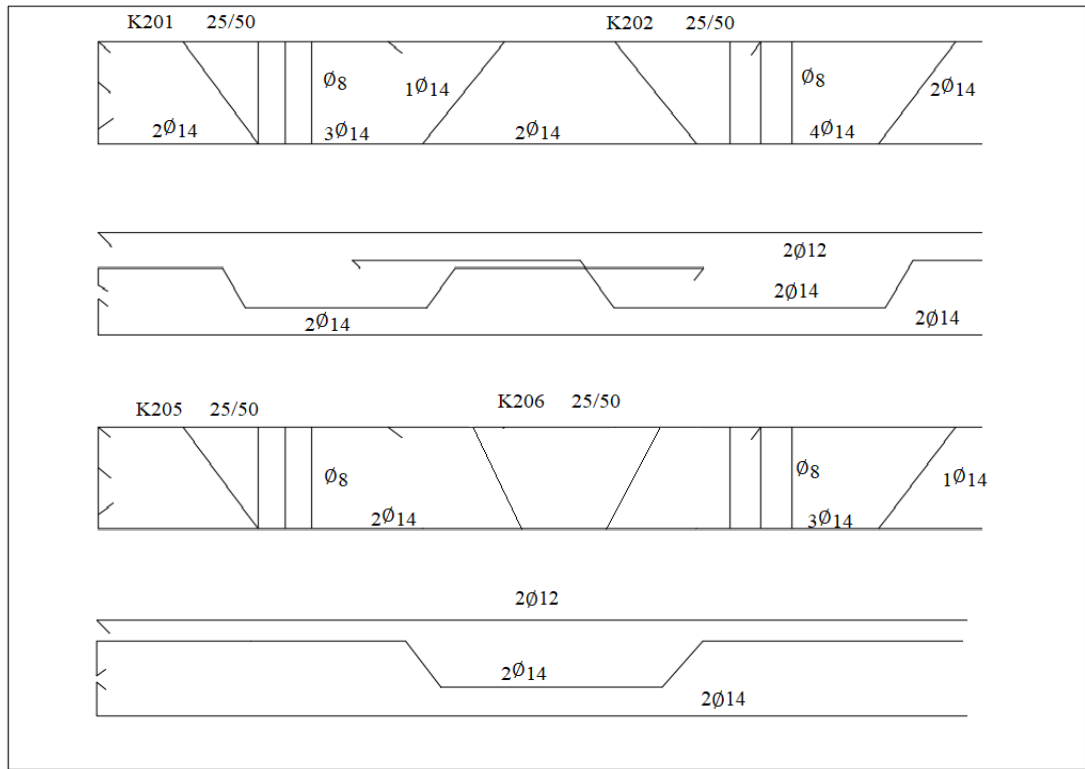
Reinforcement rebar of beams of studied building (K201, K202, K205, and K206)
